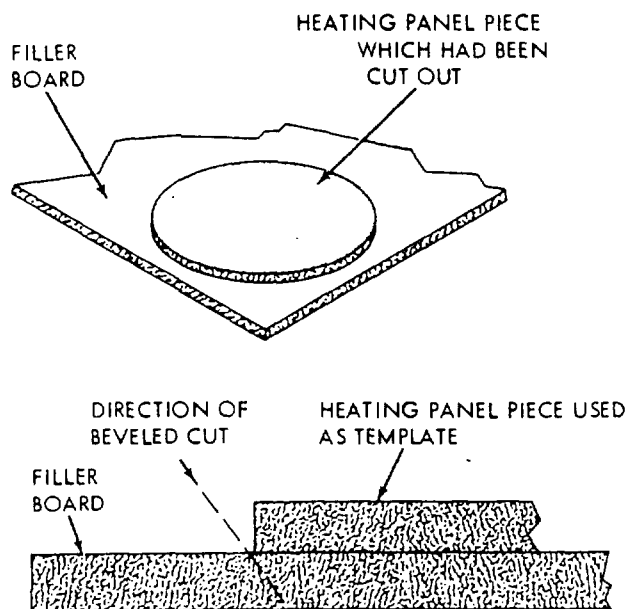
Cutting Filler Panel Plugs for Heating Panel
